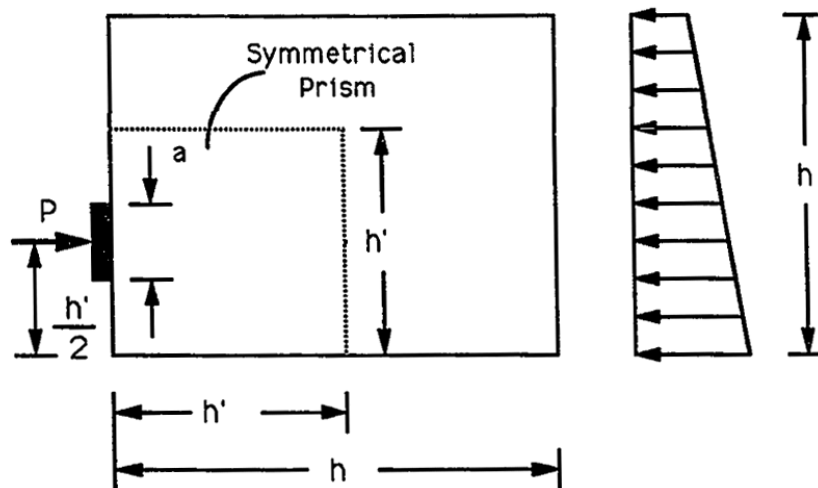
Symmetrical prism method of Guyon for a beam under eccentric prestress (Sanders, 1990)
